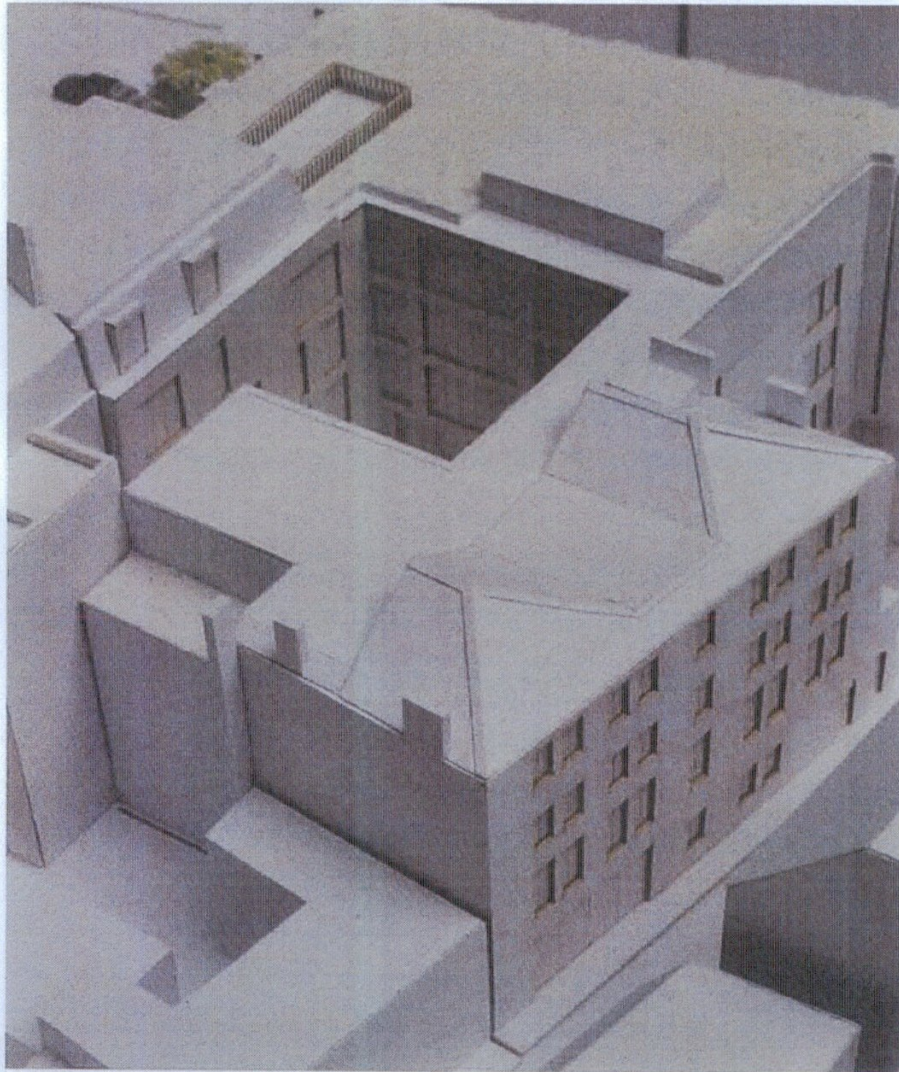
Chapel Side facade retention. 1:200 cardboard model.
